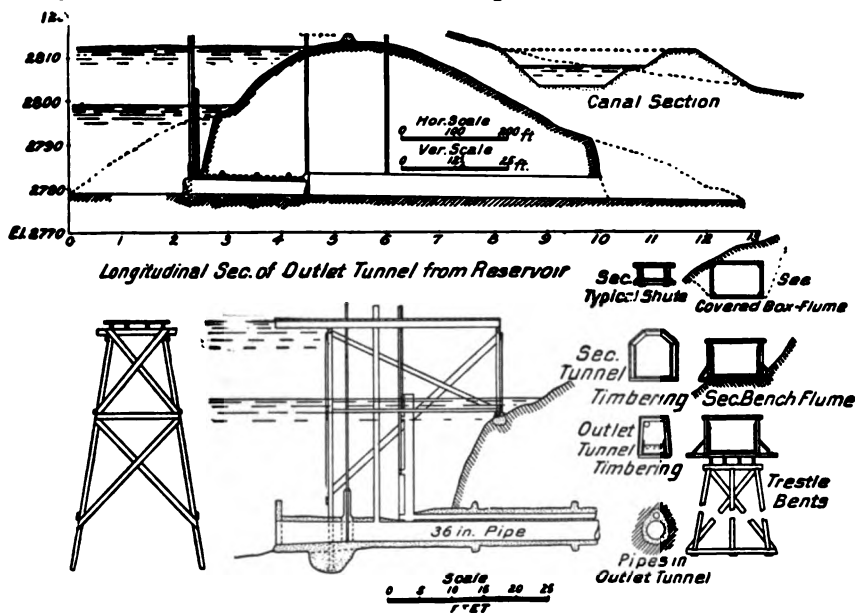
DETAILS OF TUNNEL-OUTLET OF THE ALPINE RESERVOIR.
